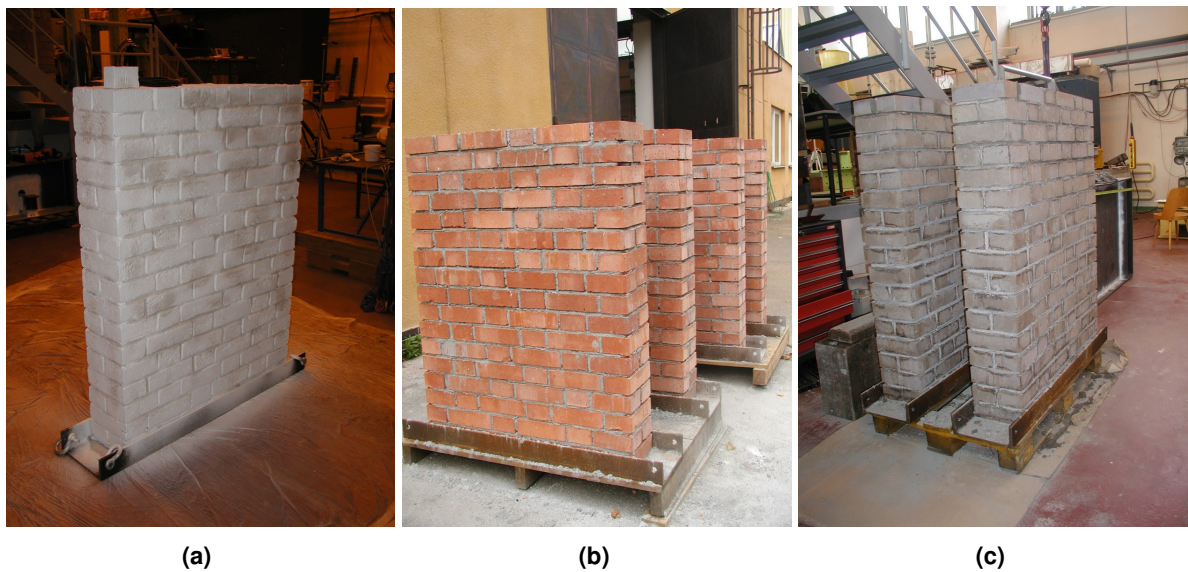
Unreinforced masonry walls: (a) adobe, (b) burned clay bricks, (c) unburned clay bricks.
